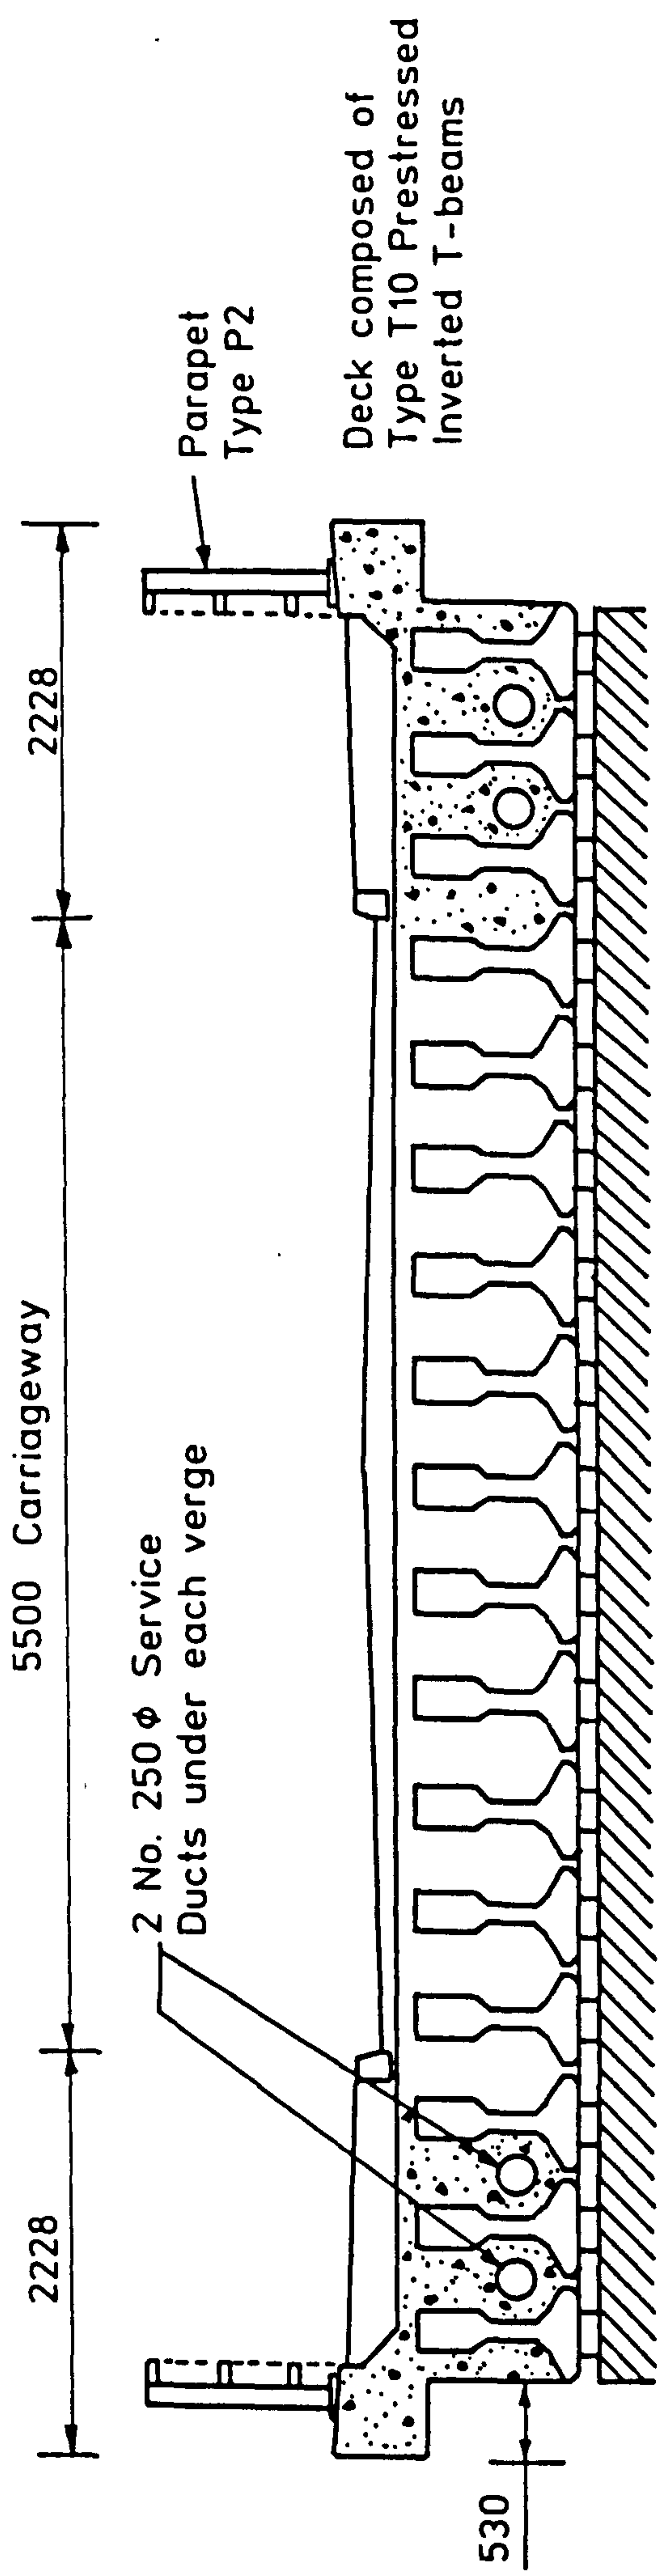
SECTIONAL END ELEVATIONS OF FULL SIZE AND MODEL DECK 2
